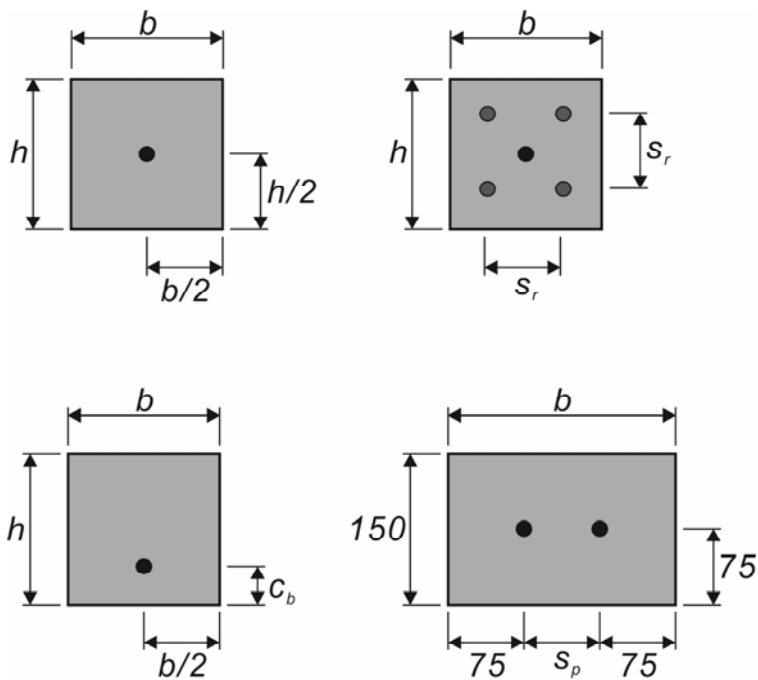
Illustrative cross sections of test specimens with Grade 1,860 strands
